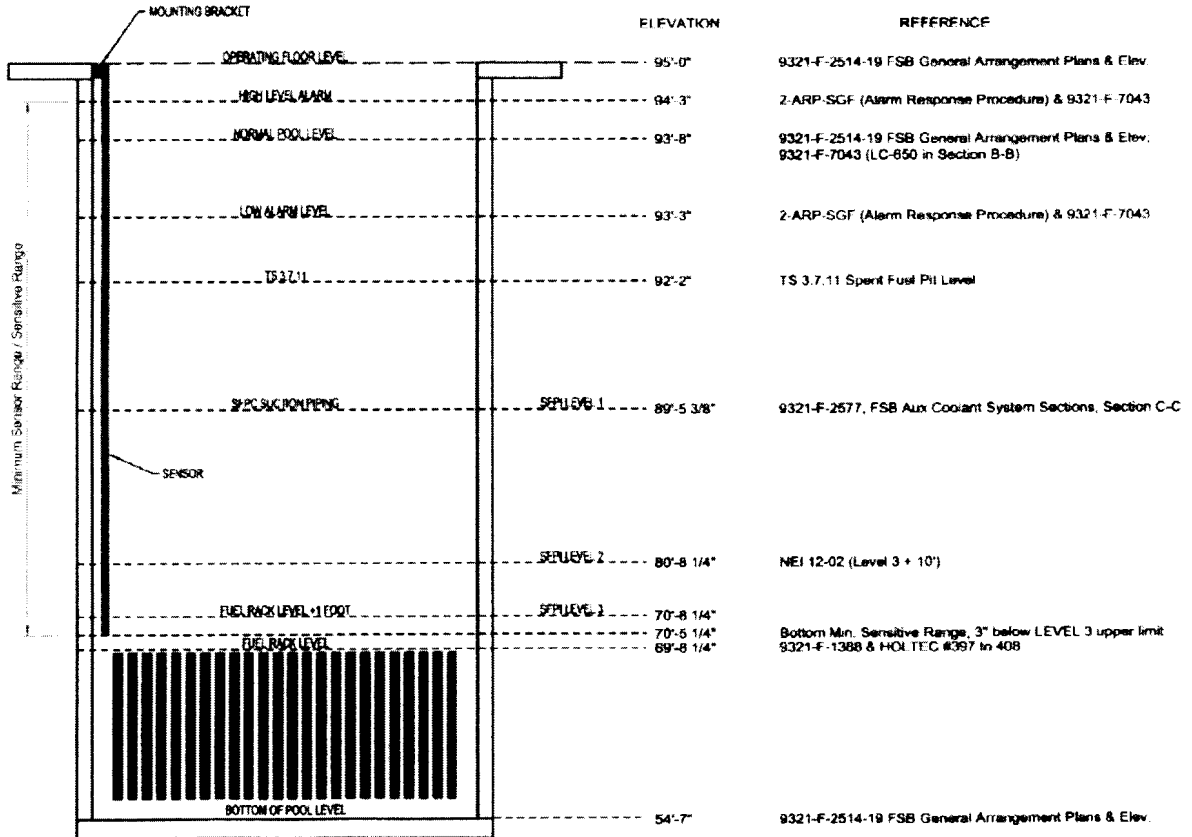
Unit 2 SFP Elevation View with Levels Indicated
